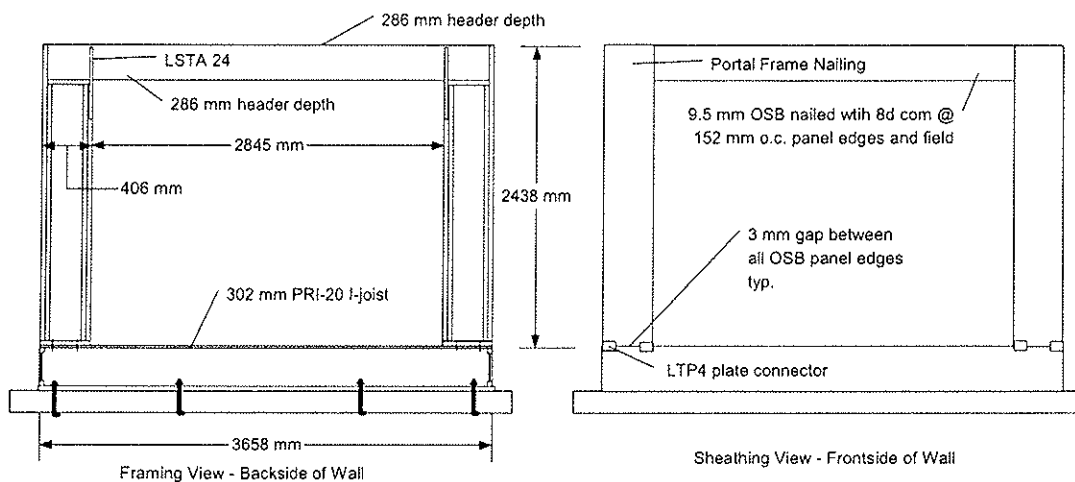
Wall construction details for the 6:1 aspect ratio portal frame wall segments
